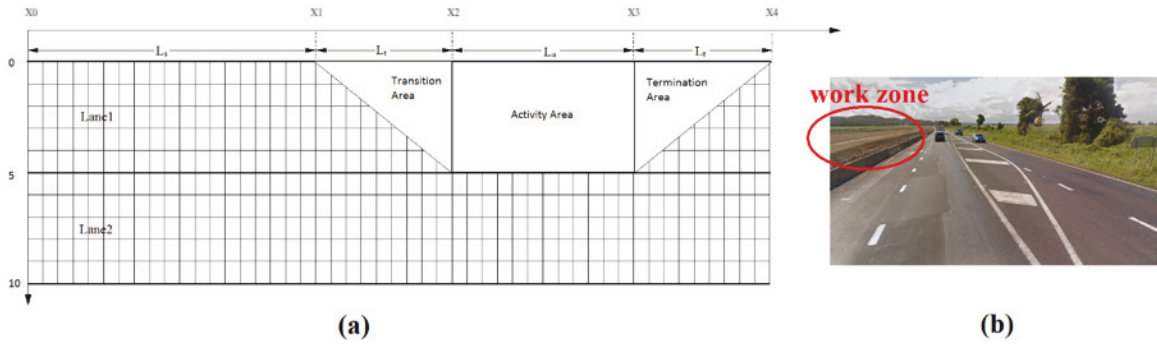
A plan view of freeway section around a work zone and a work zone on Pacific Highway
